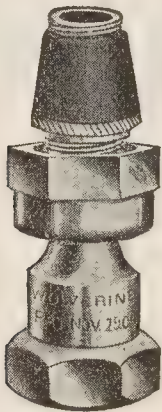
,462 TO 7,465.—Standard lavatory faucet connection fittings. Fig. 7,462, coupling nut; fig. 7,463, tail piece with ground joint and male pipe thread; fig. 7,464, assembly tail piece and nut; fig. 7,465, tail piece with ground joint and female pipe thread.
